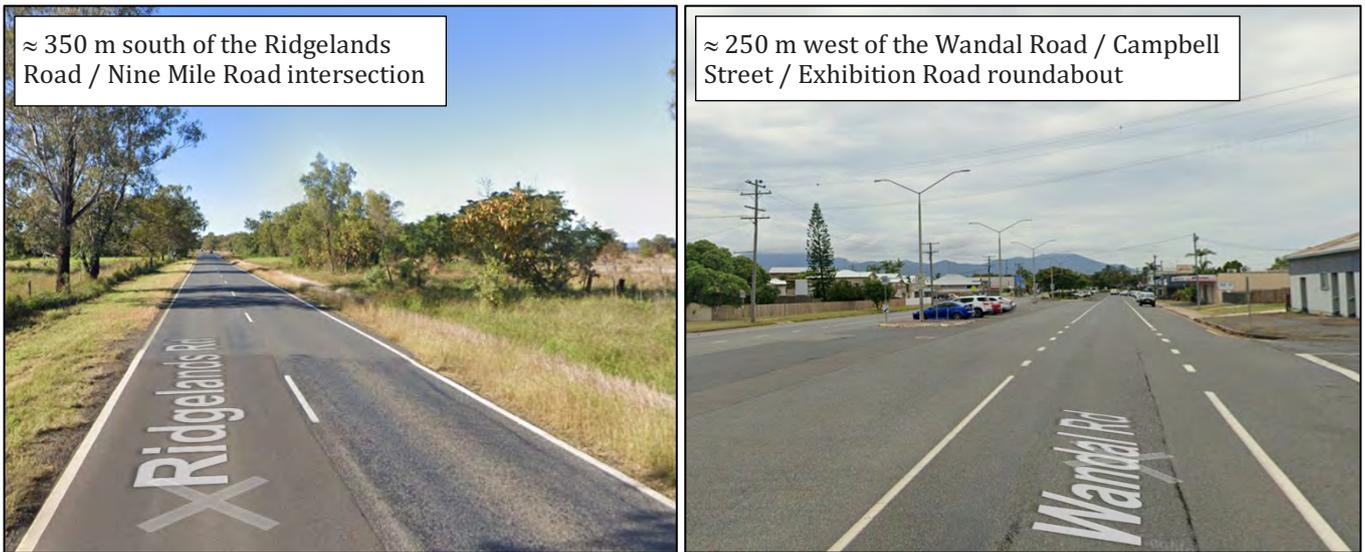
Ridgeland Road pavement conditions in year 2022 at various locations [Source: Google Street View]
